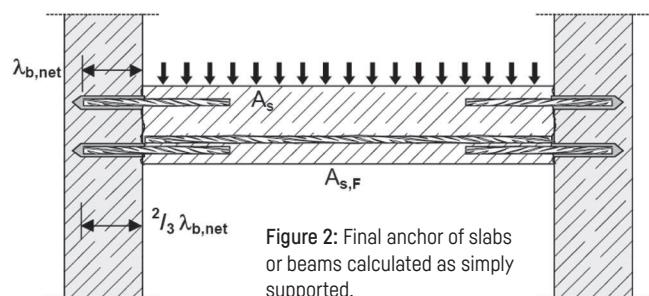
Final anchor of slabs or beams calculated as simply supported.
